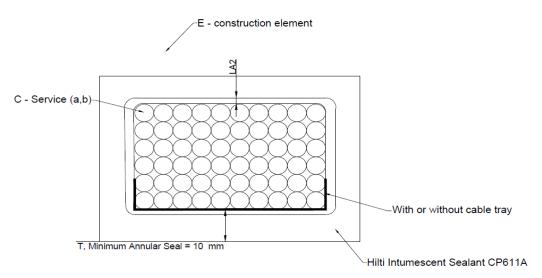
Side View, seal type 17 AS 1530.4 :2014 Standard D1 Cable Set in concrete floor
